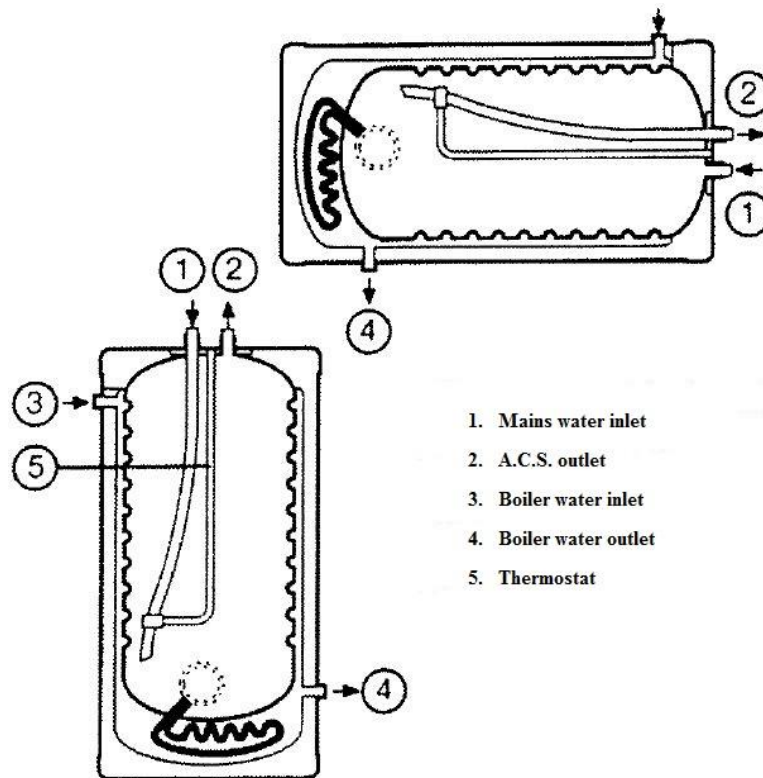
Double-walled DHW storage tank with electric heater – horizontal and vertical types [1]
